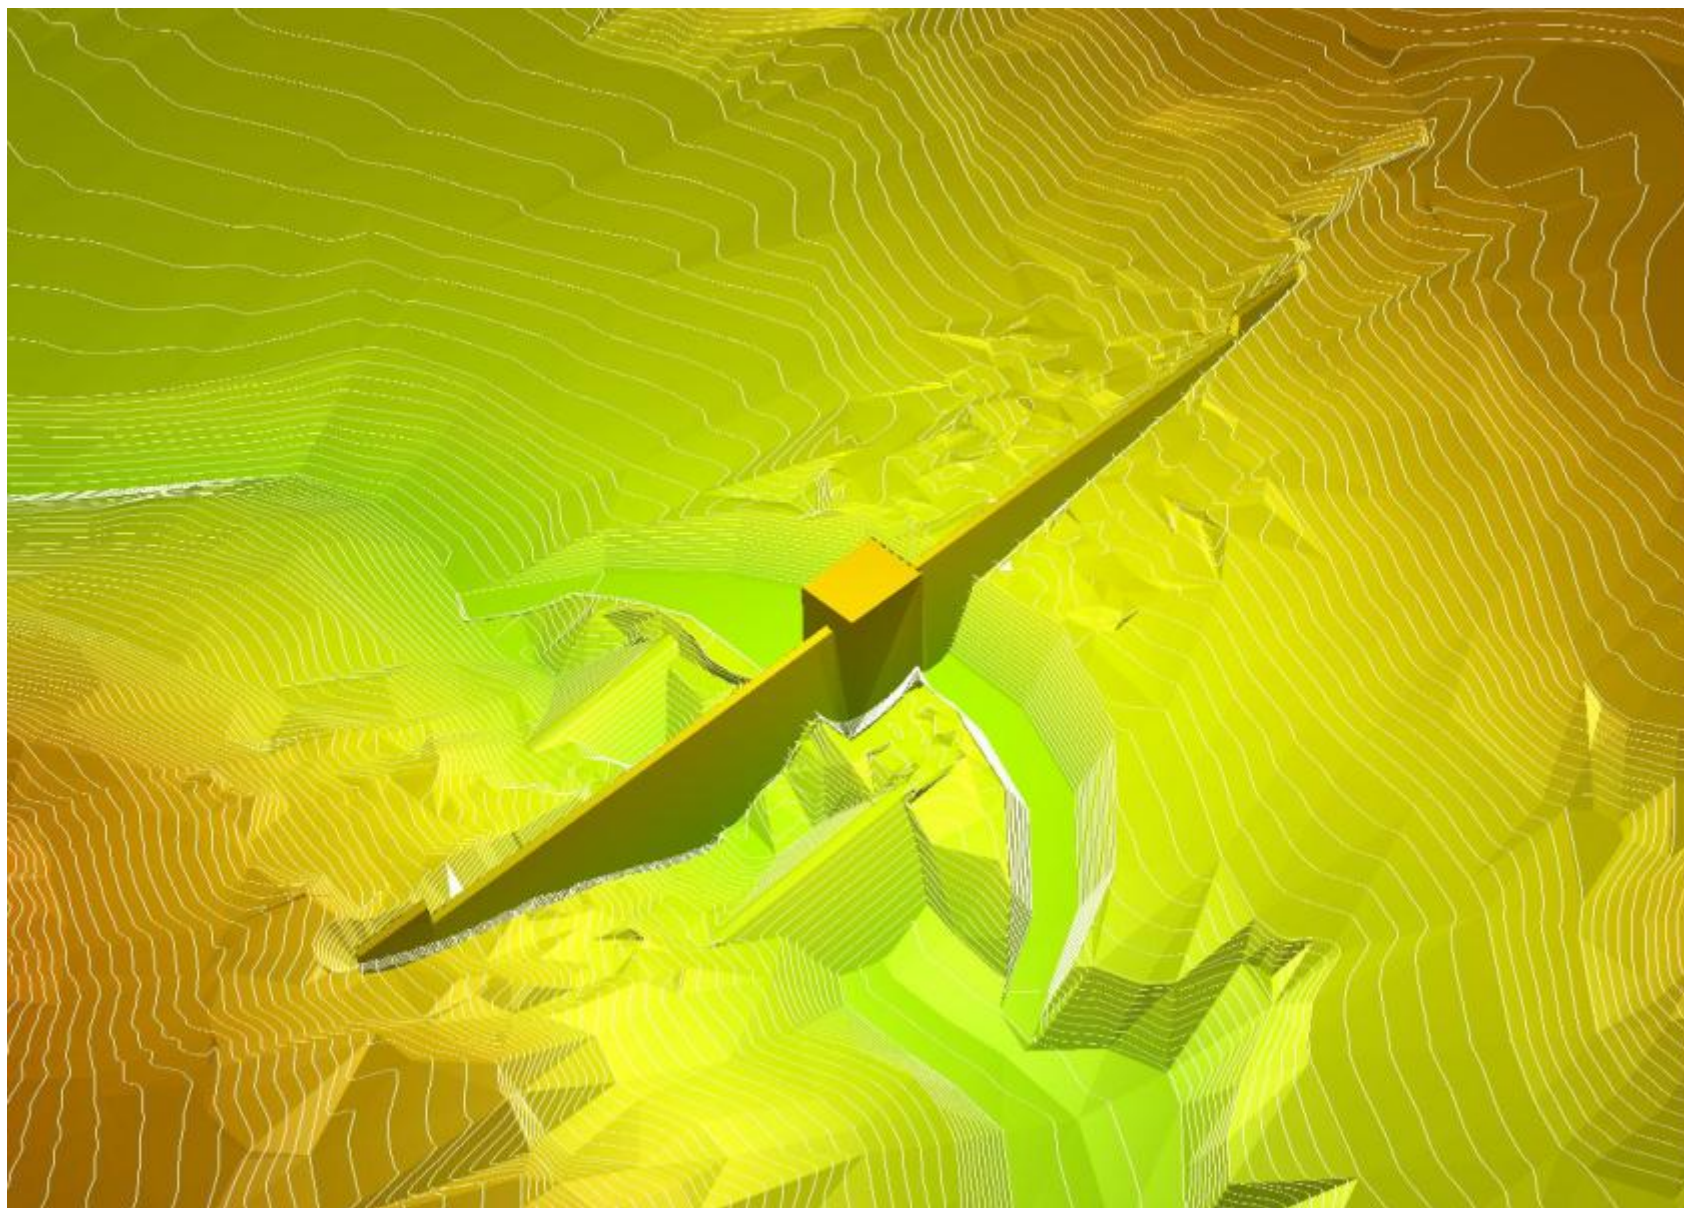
A 3D Model view of the proposed North Site Hydroelectric Power facility (Source: BKS 2013).
